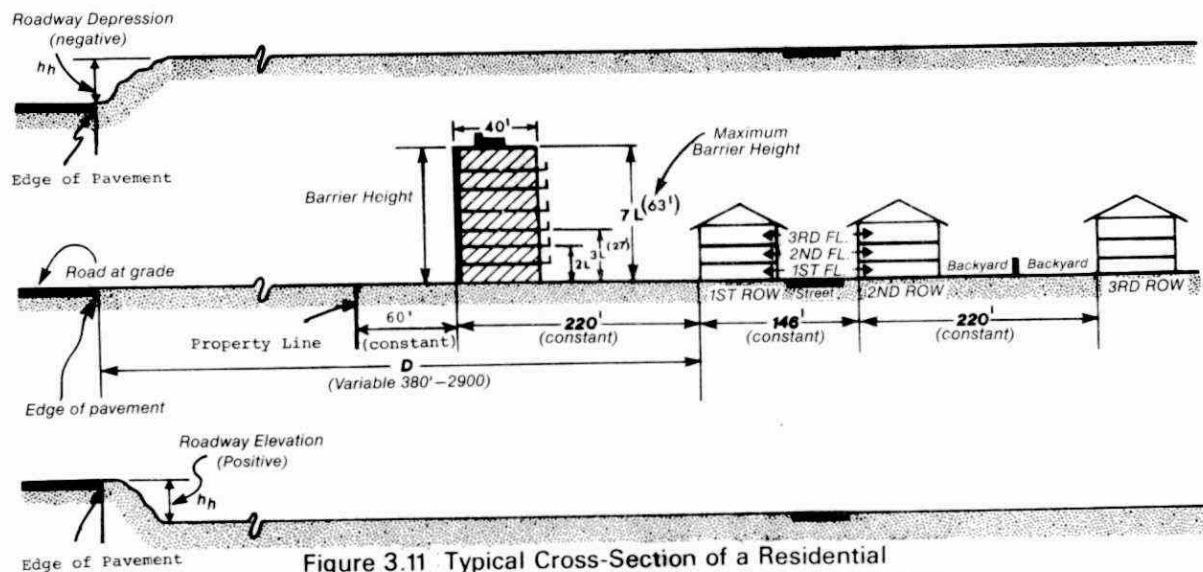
Typical Cross-Section of a Residential Subdivision protected by a barrier
